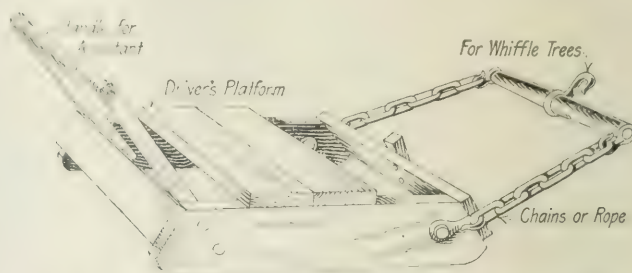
SPREADER FOR BROKEN STONE MACADAM ROAD BUILDING
